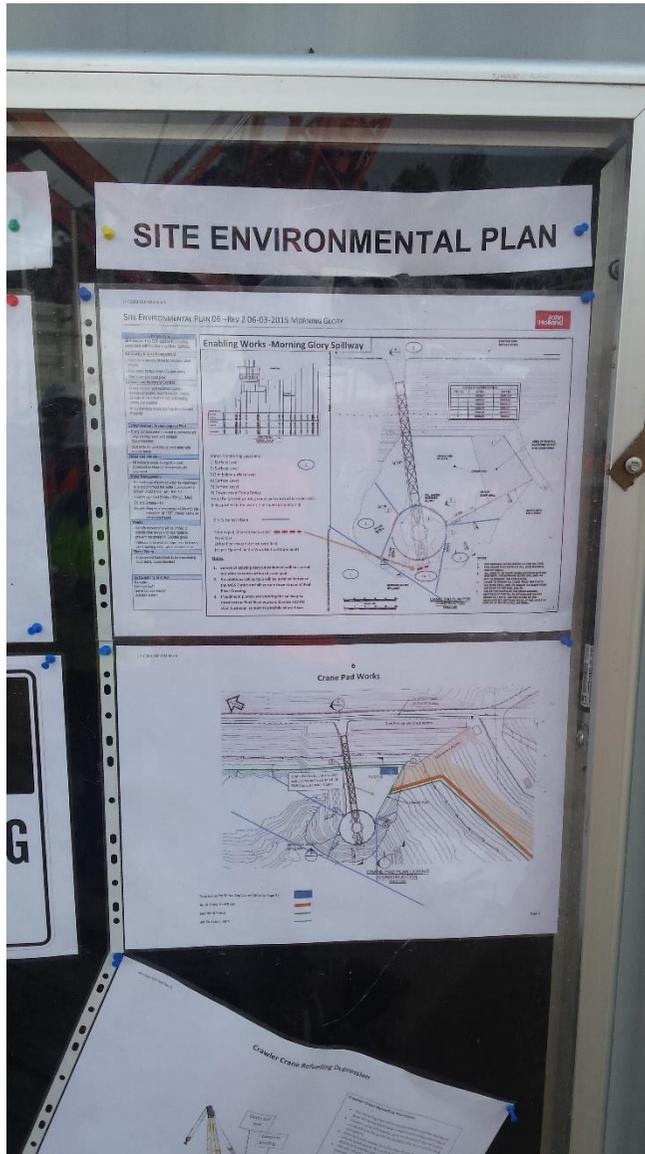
Site Environment Plan on display at Morning Glory Spillway site
